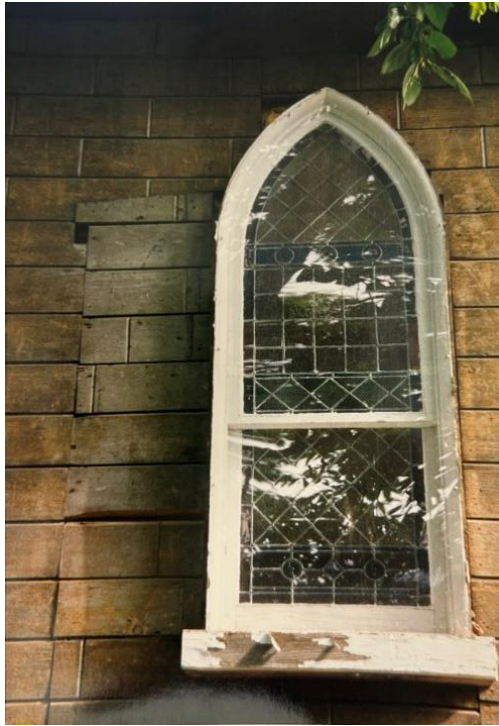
Archival Photograph of subject structure with brick-cladding removed. Note the distinct former window cutout, which has neo-classical features. Also note the wooden boards made to resemble etched stone blocks. (King Township Archives, n.d.).
